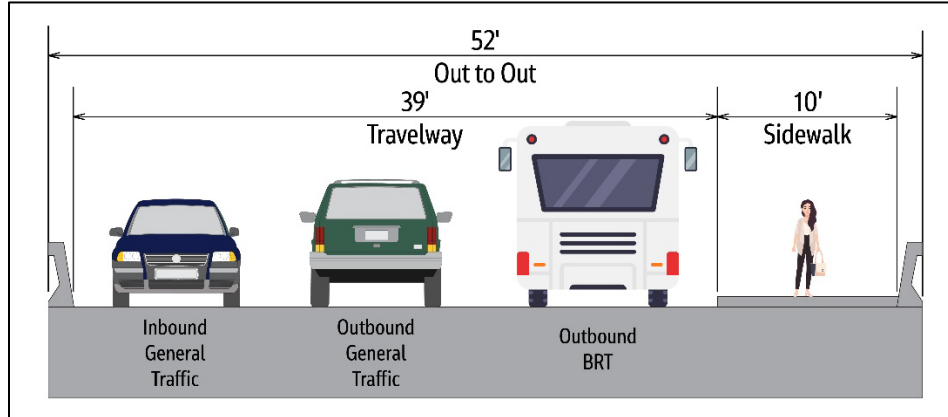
Three-lane Shifted Bridge – Castle Creek Bridge Cross Section
